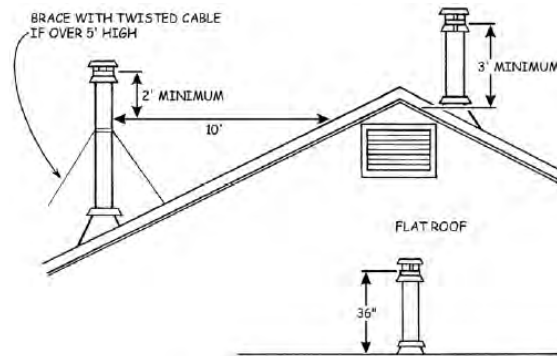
FACTORY-BUILT CHIMNEY INSTALLATION
